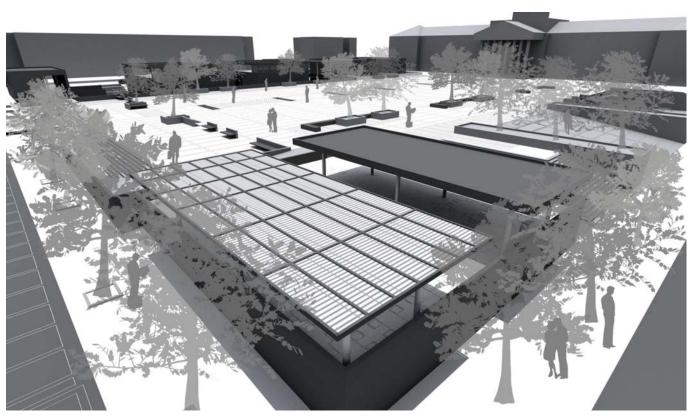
A view of the Mixing Box (restaurant) from the corner of Paul Kruger Street and Visagie Street (Author & Sackett, 2007).
